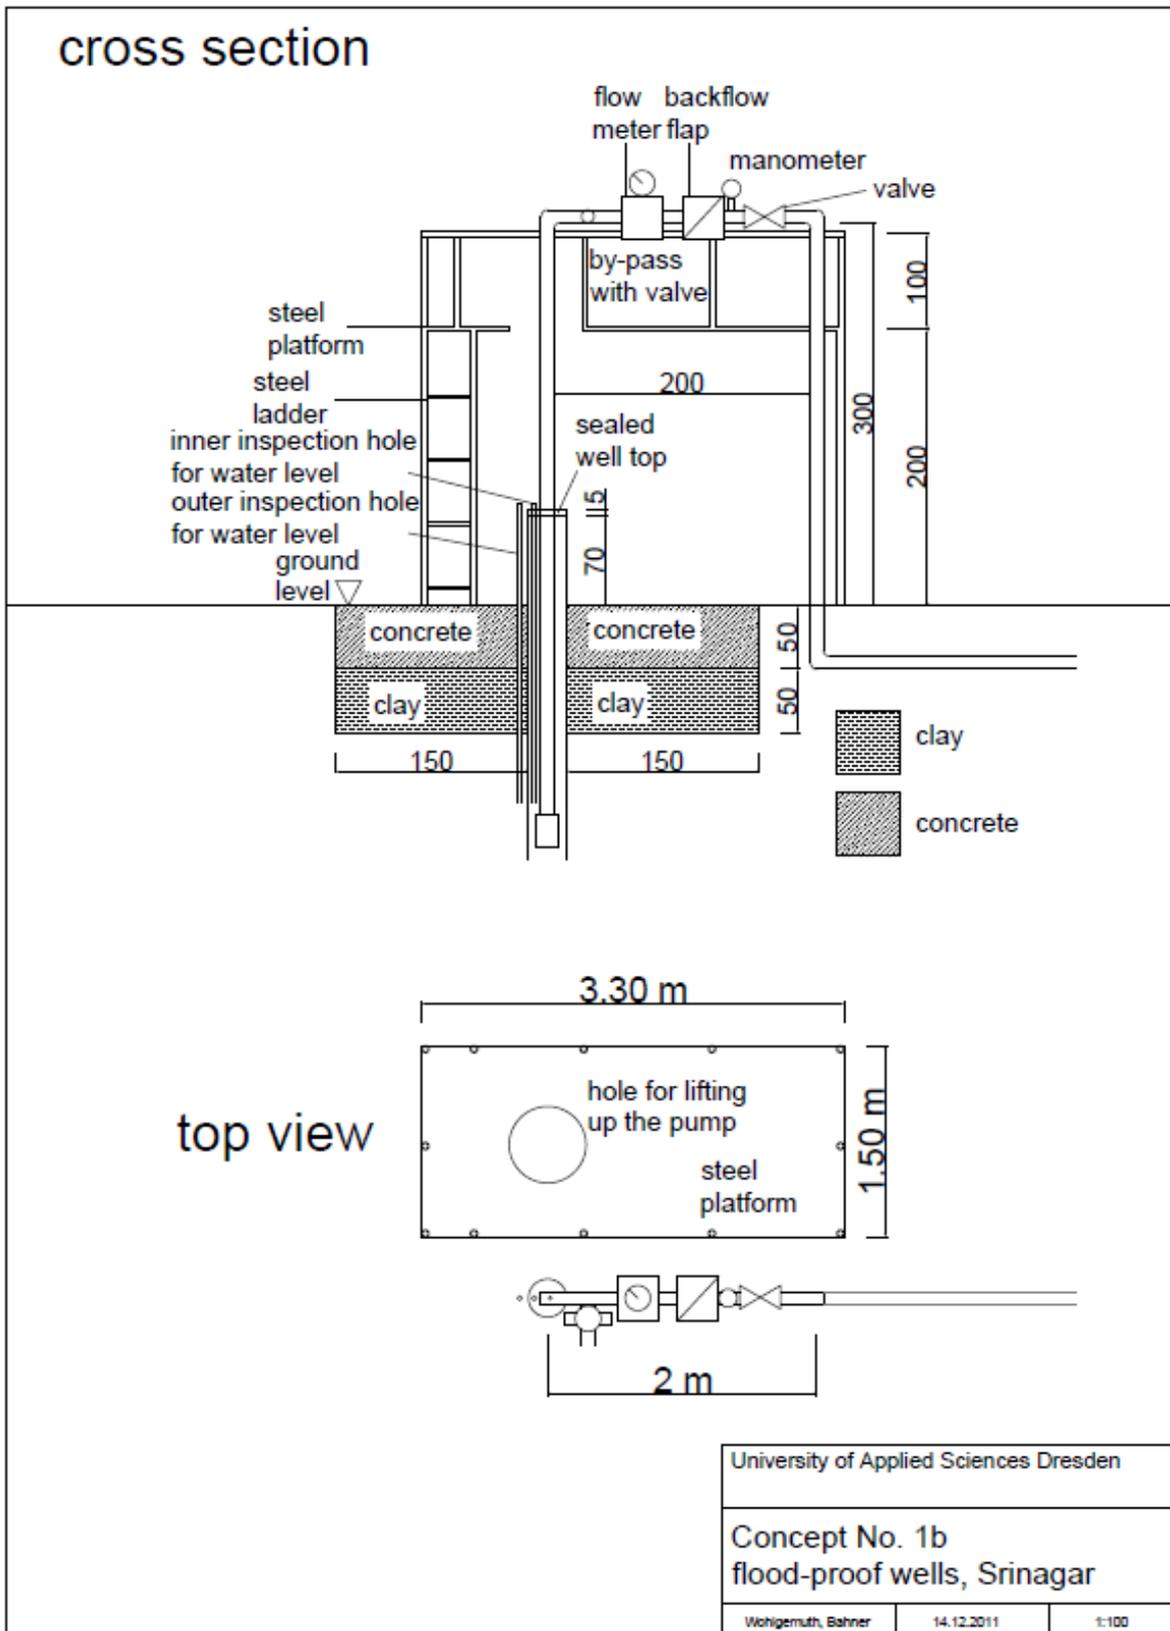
Design 2 – Elevated platform (Saph Pani, 2013)
